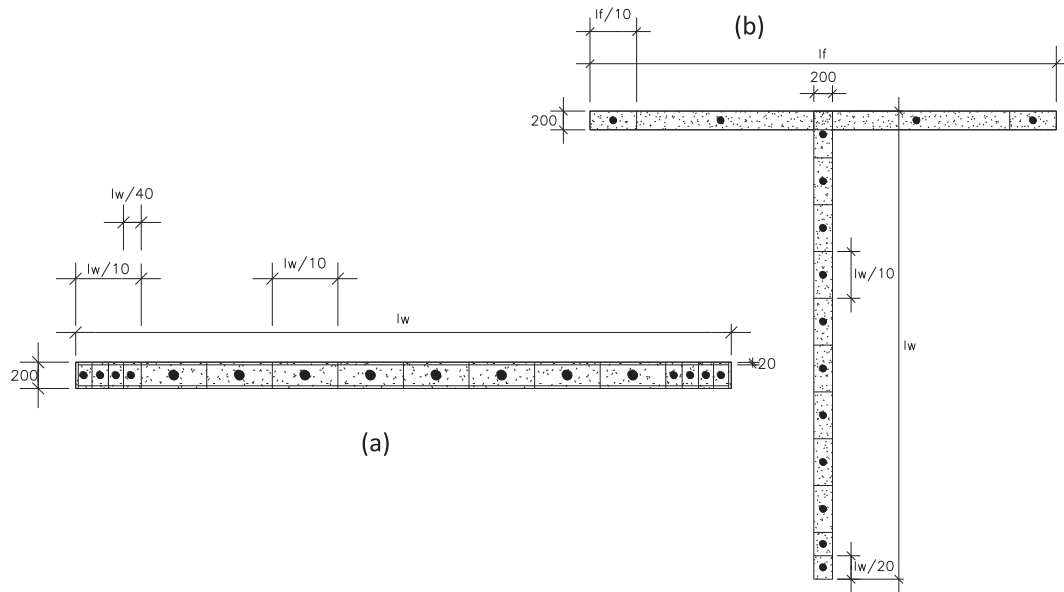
Wall section discretization—(a) rectangular and (b) T-shaped.
